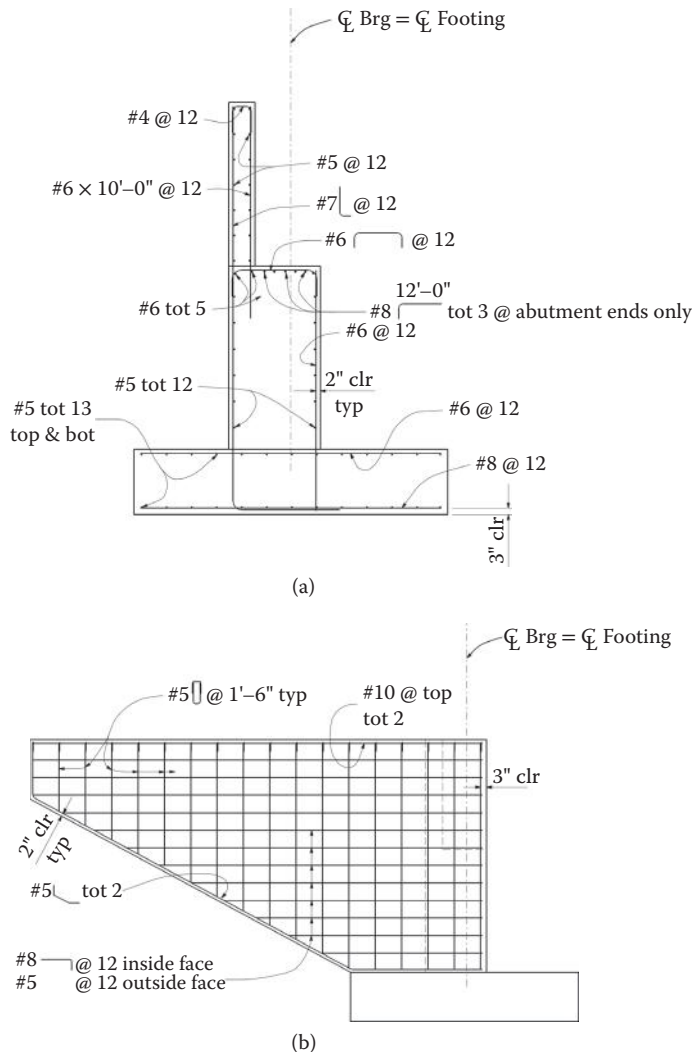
Abutment reinforcement details (example). (a) Abutment-typica section, (b) Wingwall reinforcement.
